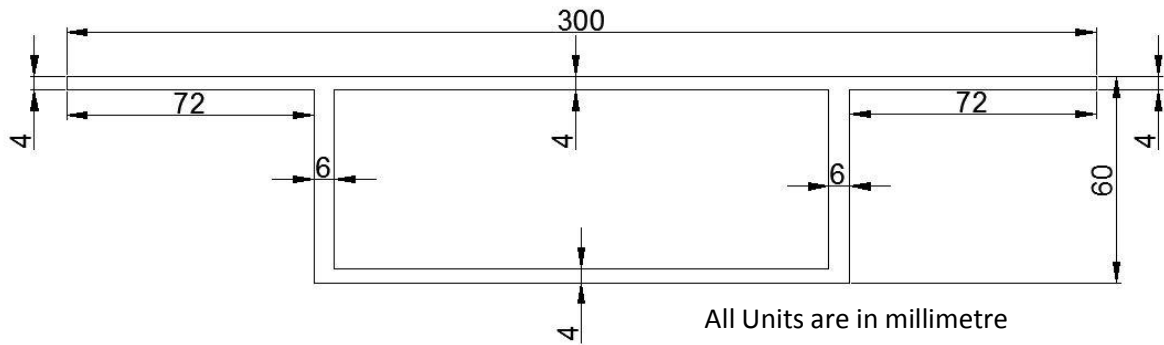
Cross Section of Simply Supported Box Girder Bridge
